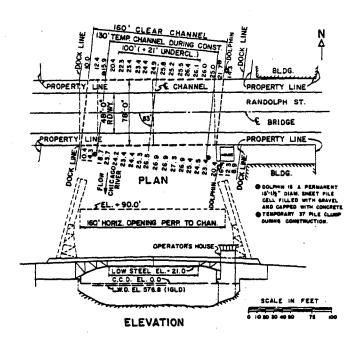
Typical "Permit Drawing" Showing Channel Width and Underclearance, Both Closed and Open, that Must Be Provided
